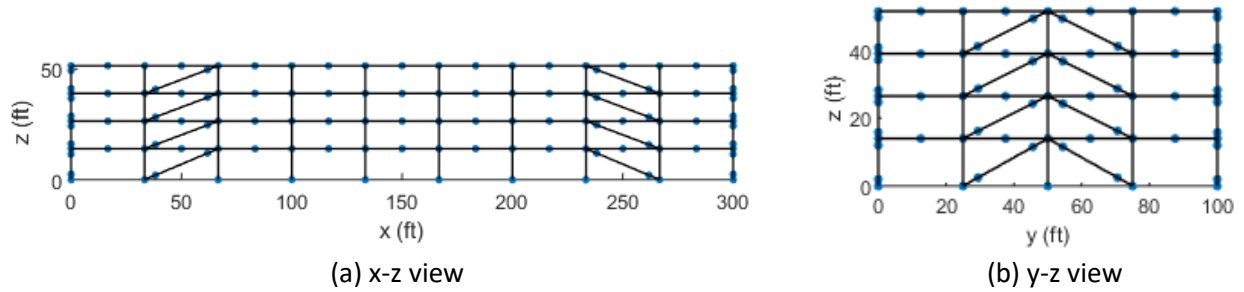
Schematic view of BRB modeling in 4-story archetype building
